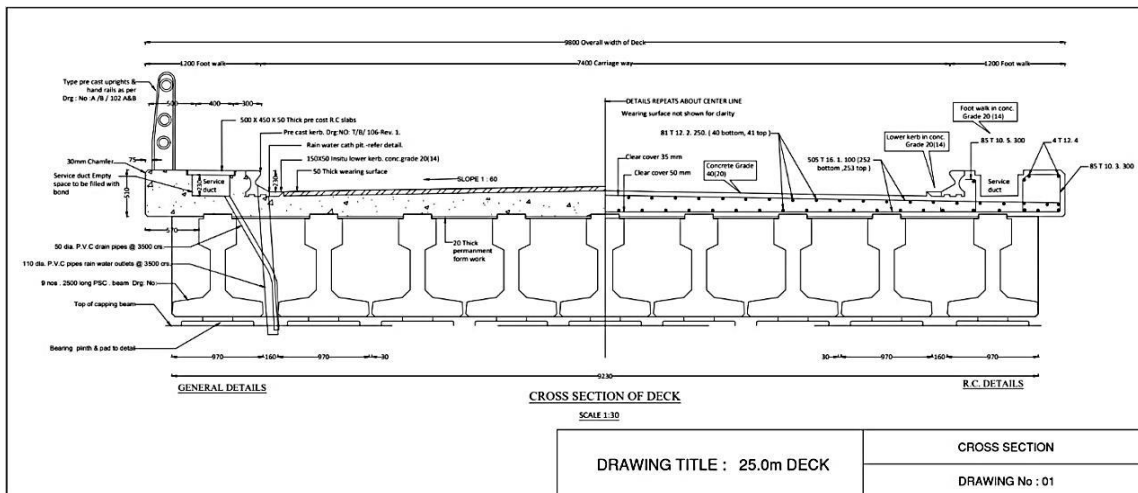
Two Lane beam and slab deck span 25.0m M Beam.
